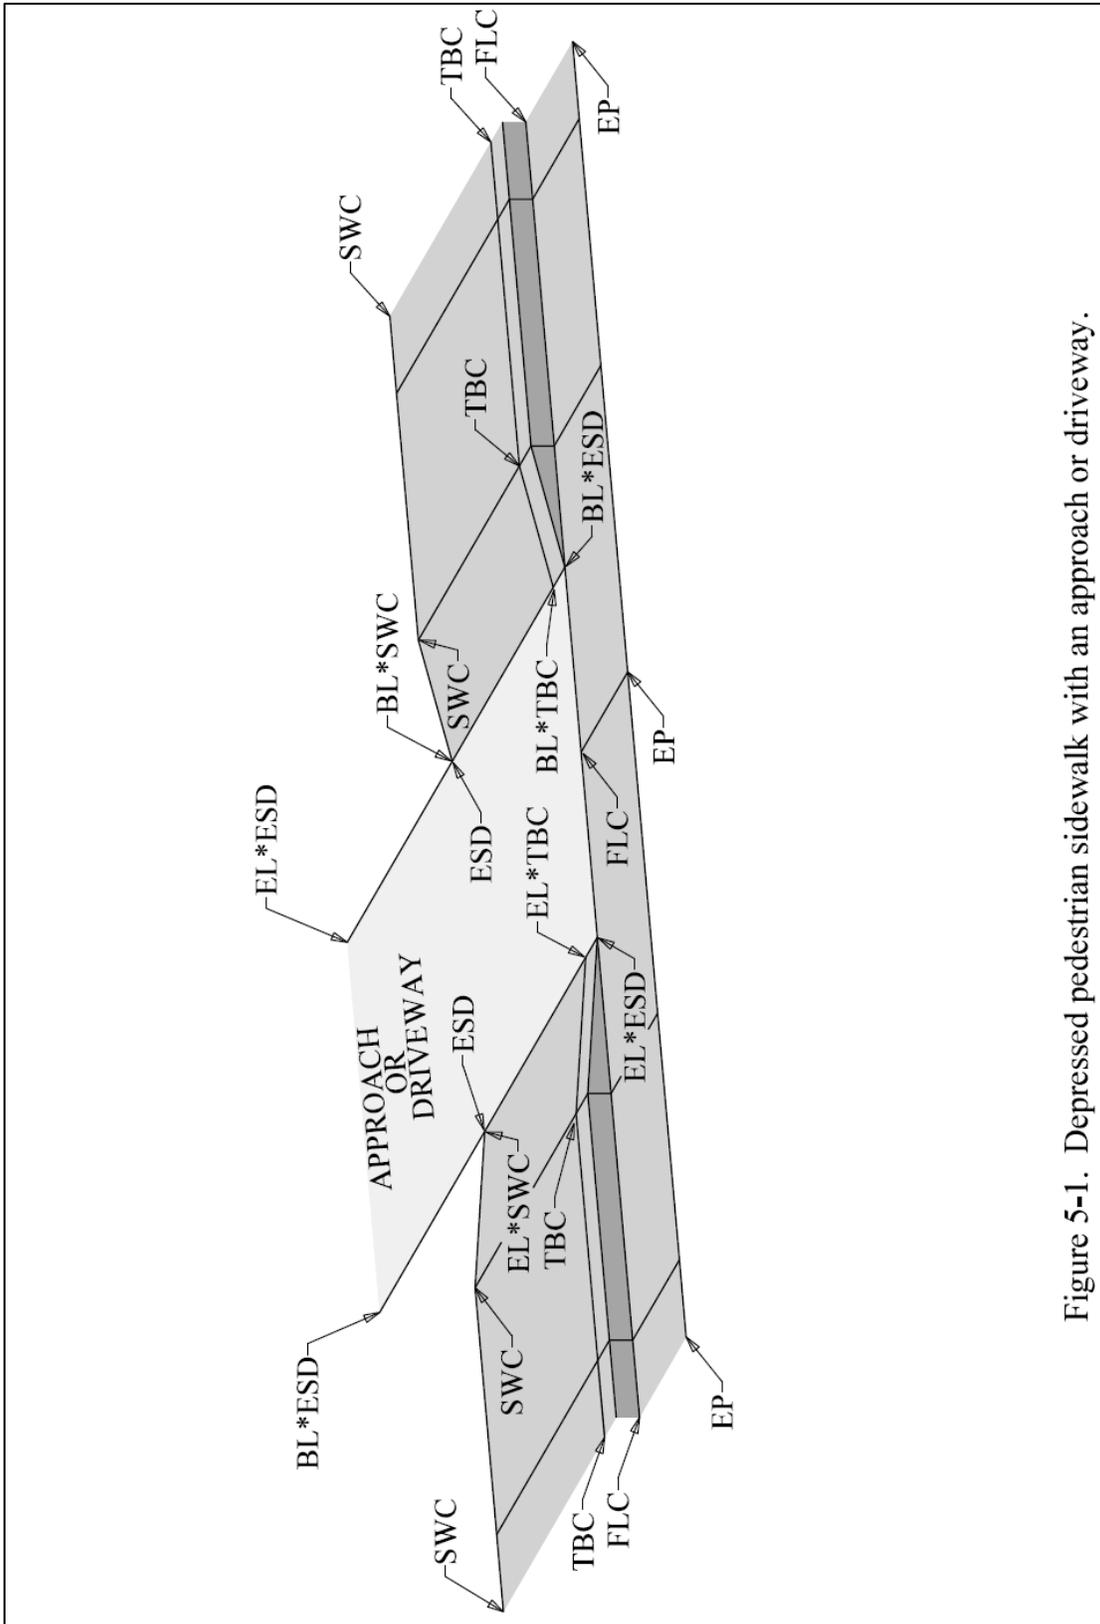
Depressed pedestrian sidewalk with an approach or driveway.
